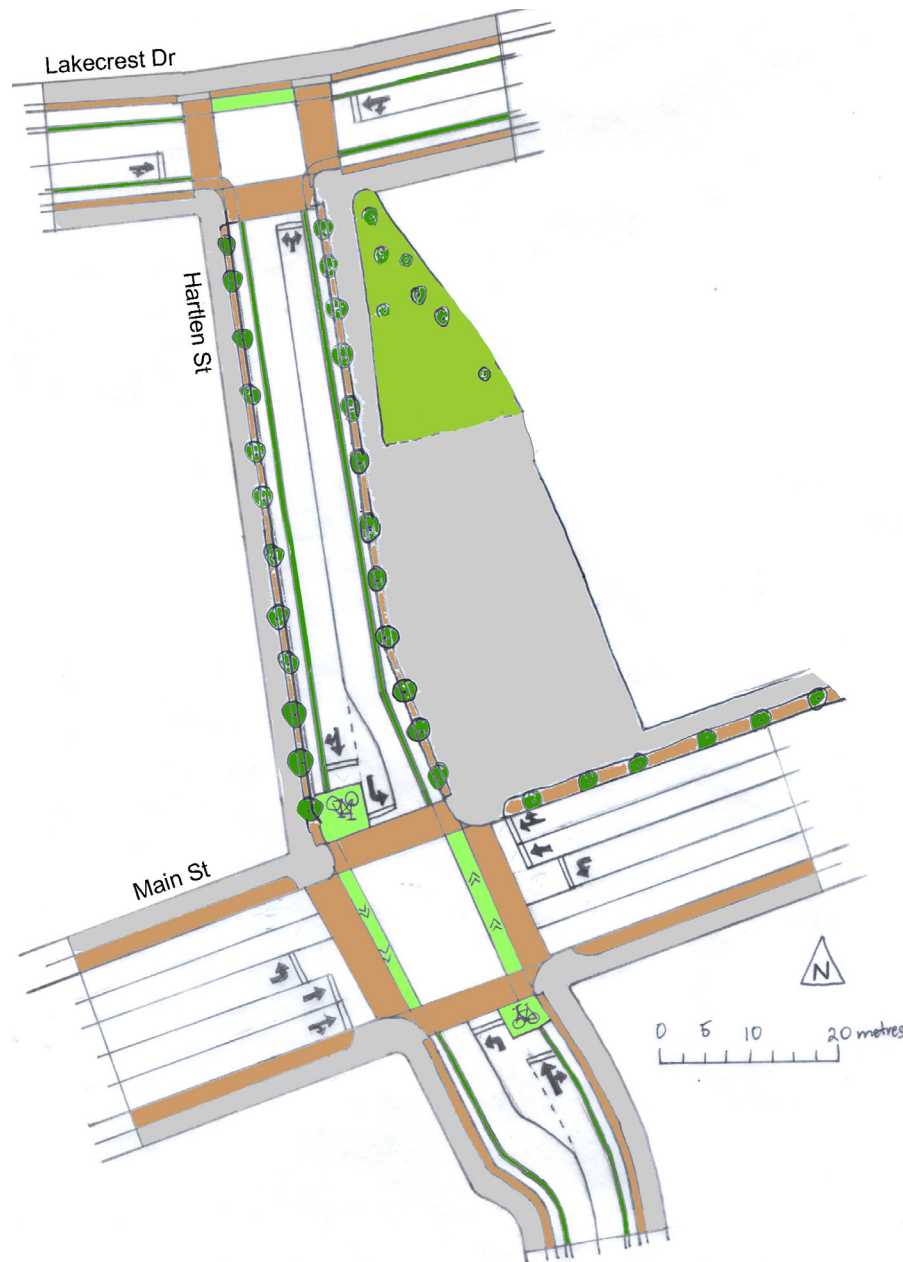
Plan of Hartlen St. Extension's New Intersections & New Street
